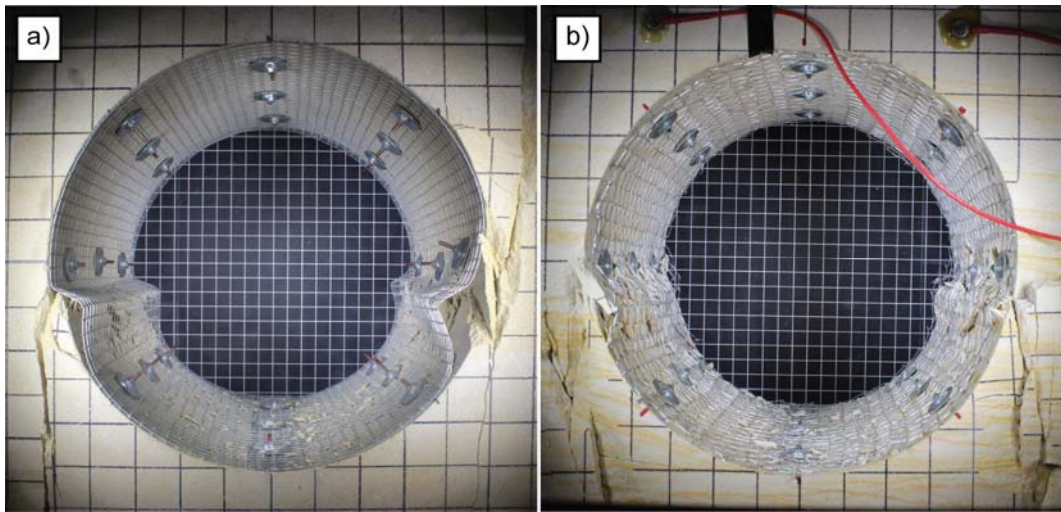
Failure on tunnel sidewalls a) stiff welded mesh (Specimen No.3) b) chain link mesh (Specimen No.9).
